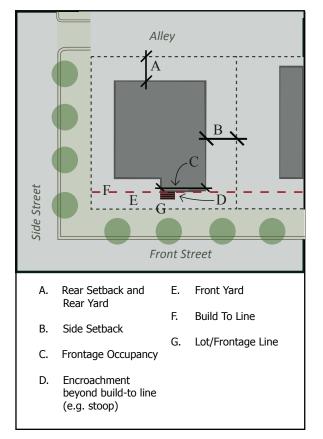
BUILDING PLACEMENT AND ENCROACHMENTS
